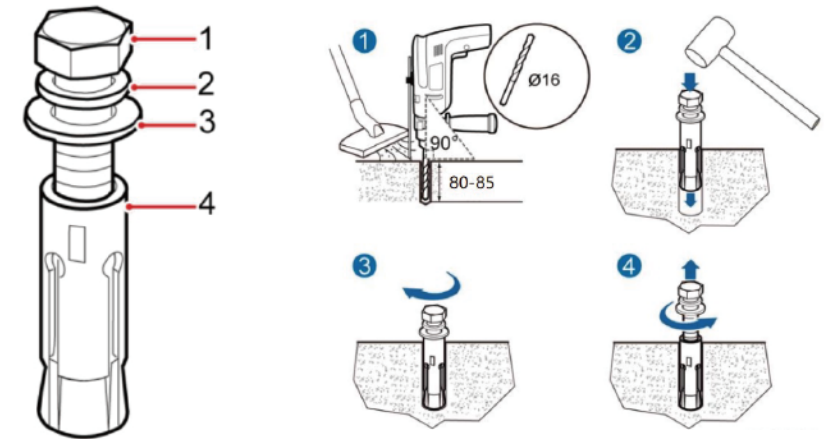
E-MATE-R18 Rack fixed hole size drawing (unit: mm)
